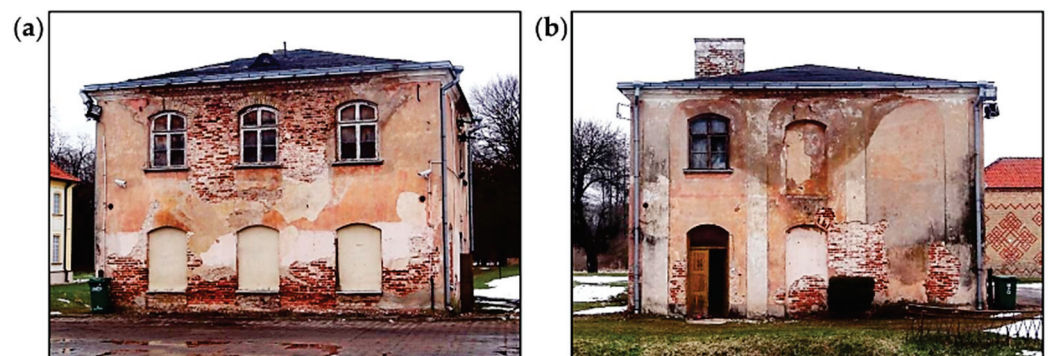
Pavilion building: (a) front elevation and (b) side elevation.
